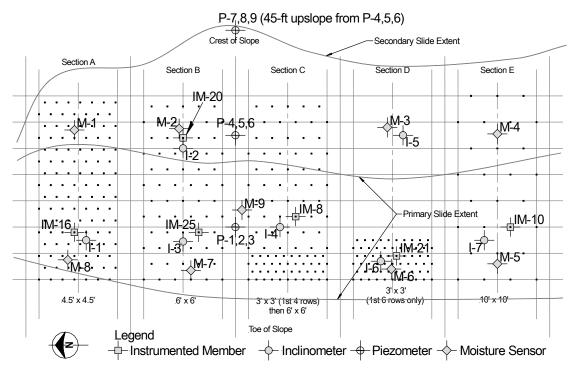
Plan view of US54-Fulton test site showing locations of instrumentation.
